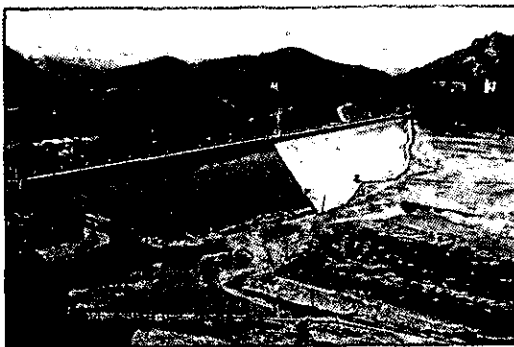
At Sa Forada embankment dam (Italy) the exposed membrane system was installed to rehabilitate a bituminous concrete facing which had deteriorated after 20 years of service, despite repairs carried out every 10 years
